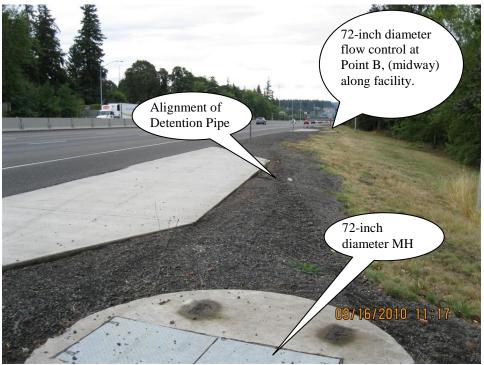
20-foot deep inlet manhole at upstream end of detention tank/pipe facility.
